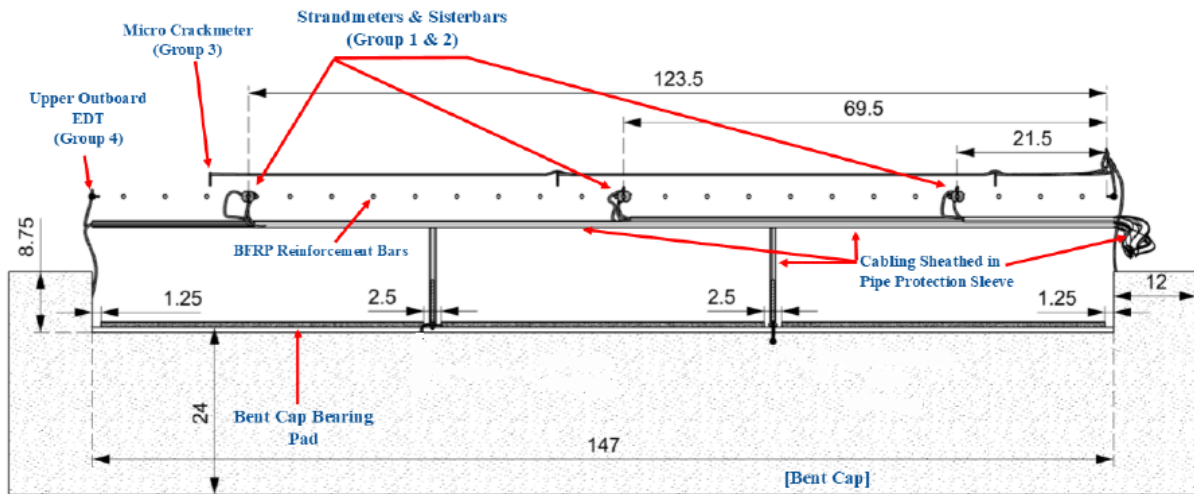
Drawing, Bent Cap End View (Slabs, Beams, and Parapets not Shown)
